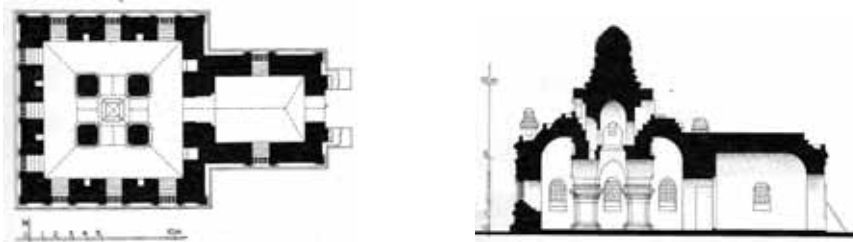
Ground floor plan and cross section of Nan-Phaya temple
